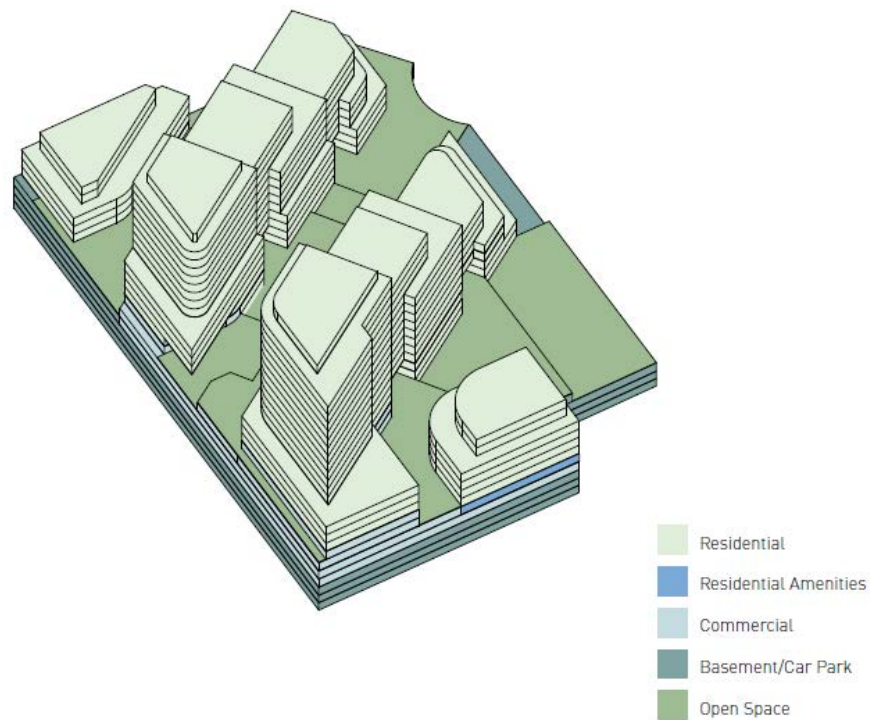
Massing model of the proposed development showing the land use arrangement. (Source: PTW Architects, May 2017)
